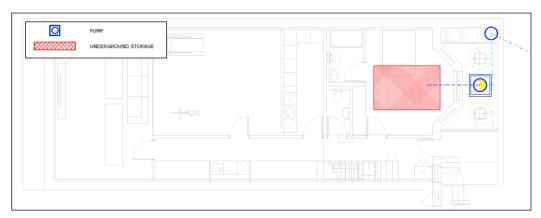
Indicative drainage layout plan showing the proposed location of SuDS.
